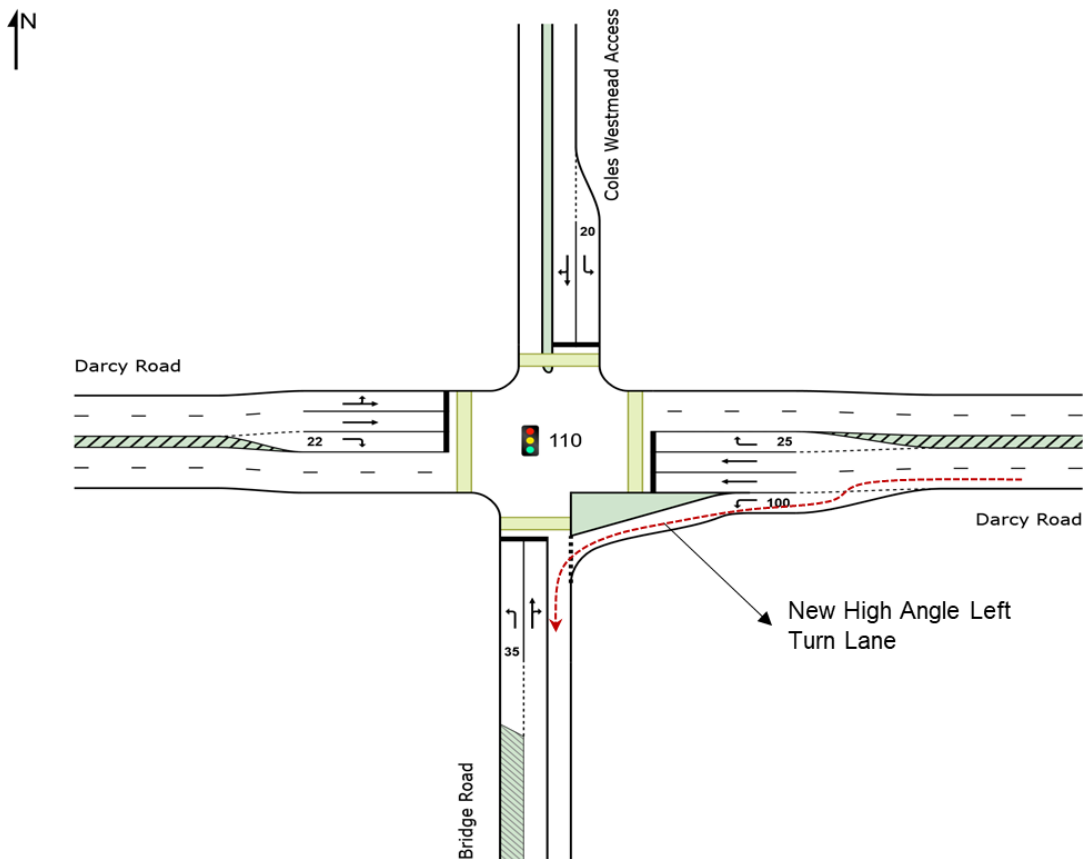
Proposed High Angle Left Turn Lane at the Darcy Road / Bridge Road Intersection
